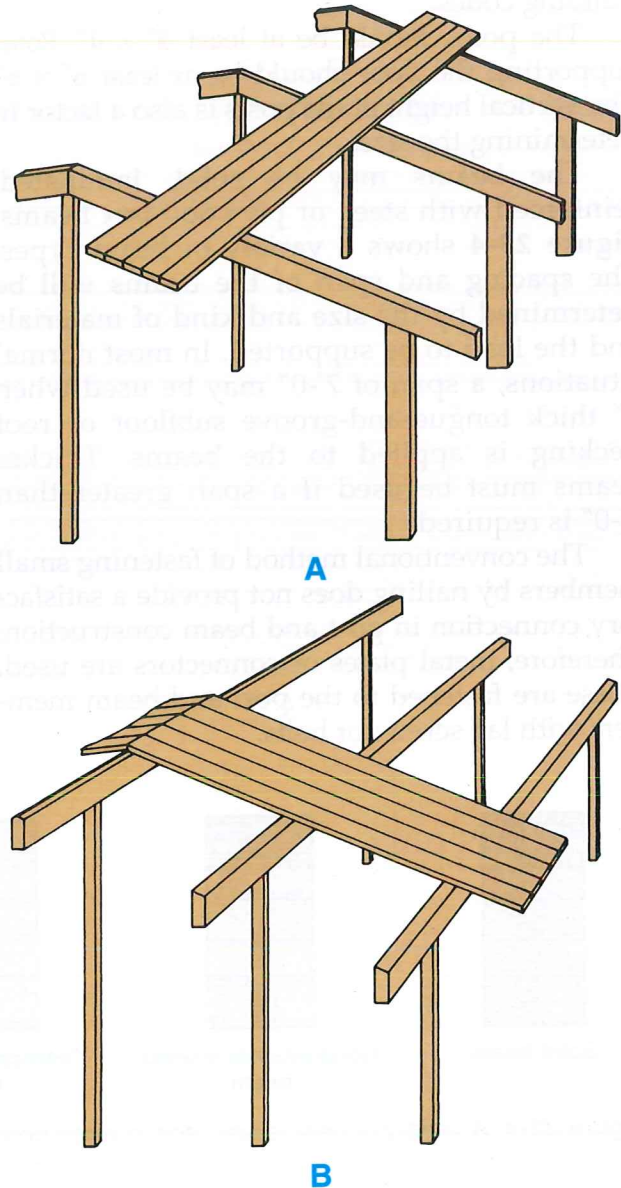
Post and beam construction may be either longitudinal or transverse. In either case, the primary framing members are spaced farther apart than in conventional framing. A—Longitudinal construction. B—Transverse construction.
